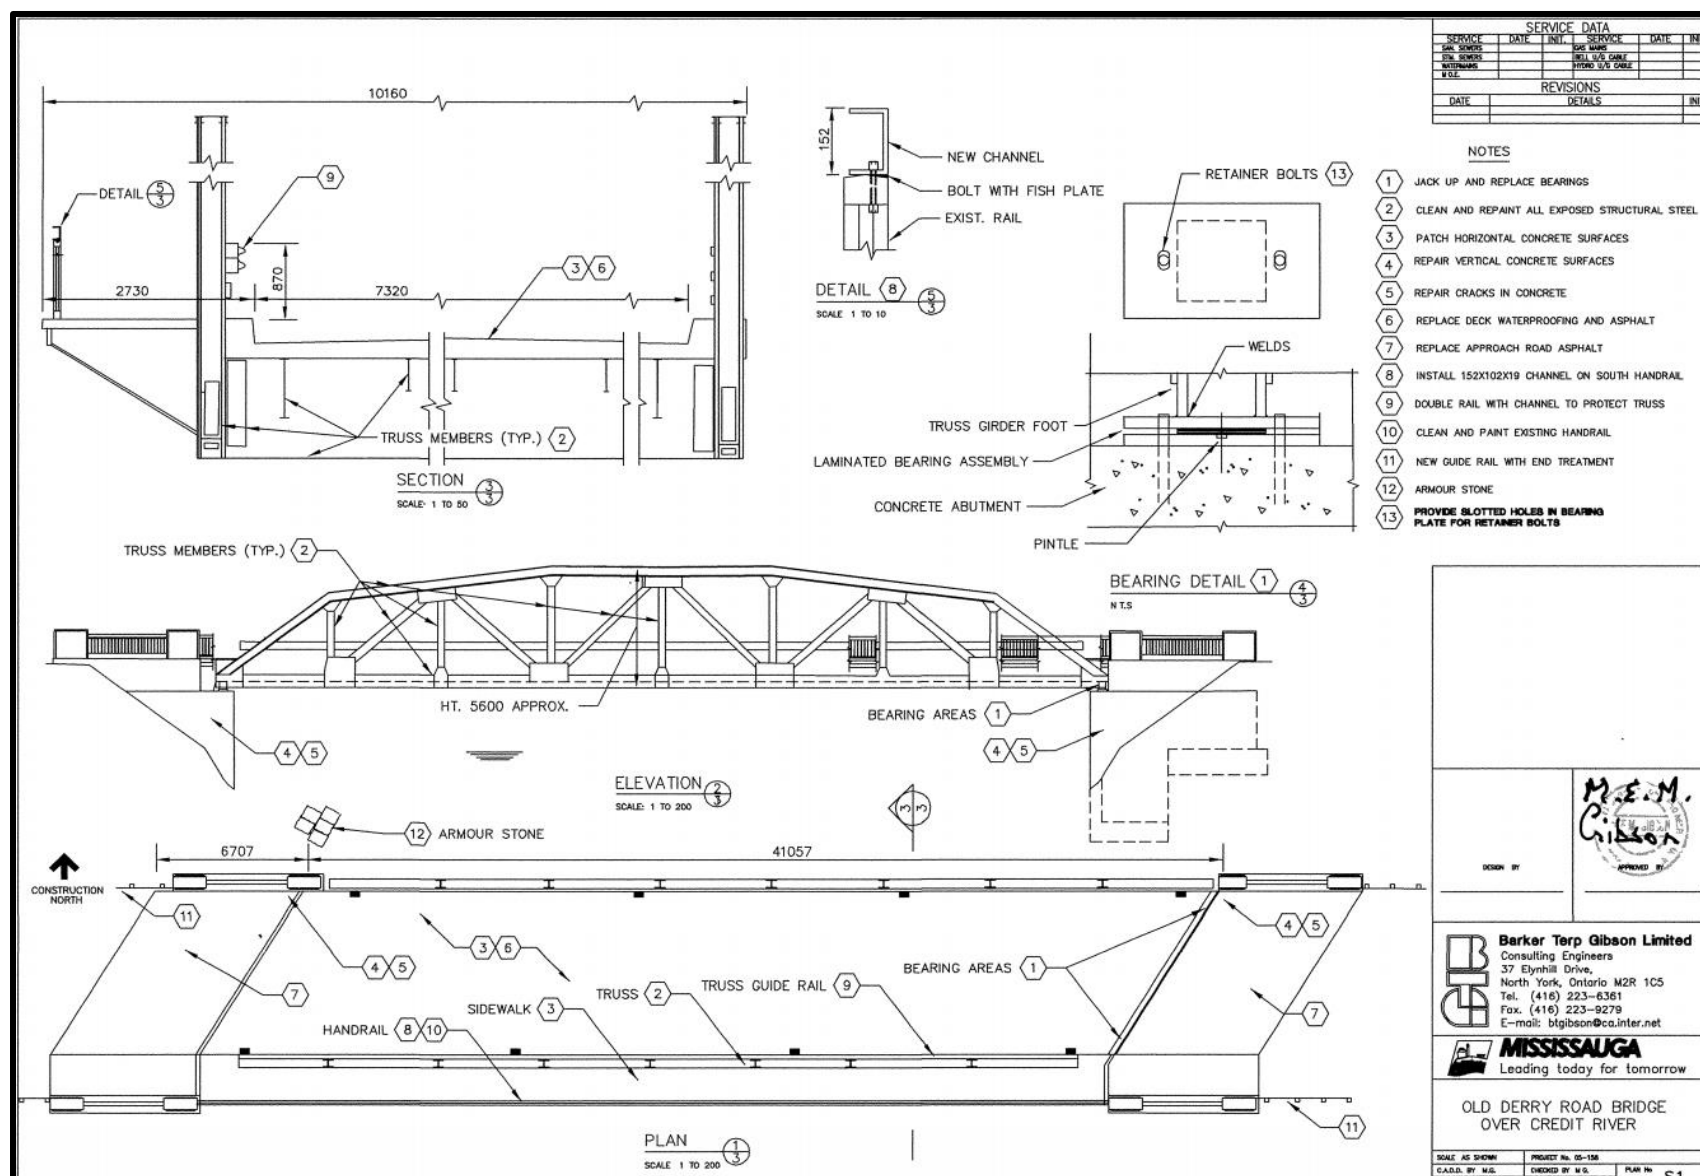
Old Derry Road Bridge Drawing (details are from 2005 Bridge Rehabilitation)
